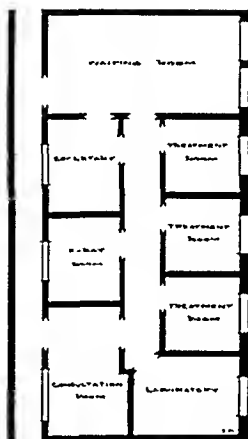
Floor plan based on the author's recollection of Dr. Herman Kretschmer's office.
